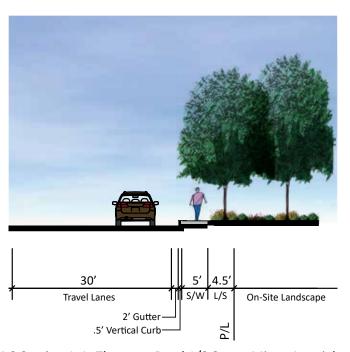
Section A-A, Thornton Road 1/2 Street Minor Arterial
